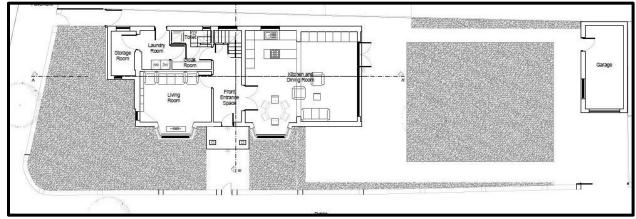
Existing Ground Floor Plan – 80 Westbere Road, London
